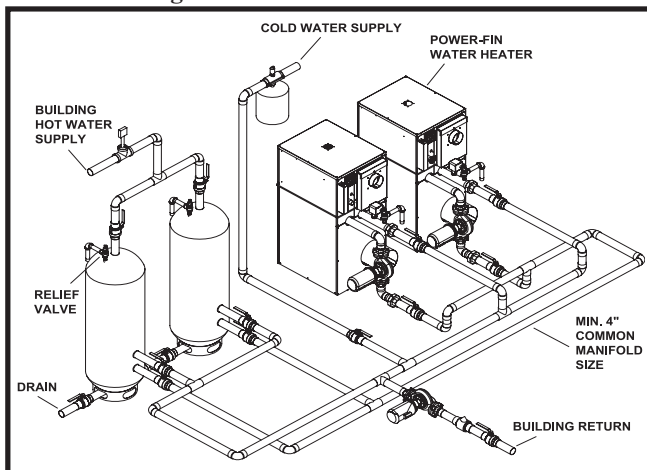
Multiple Water Heater Piping with Multiple Storage Tanks
